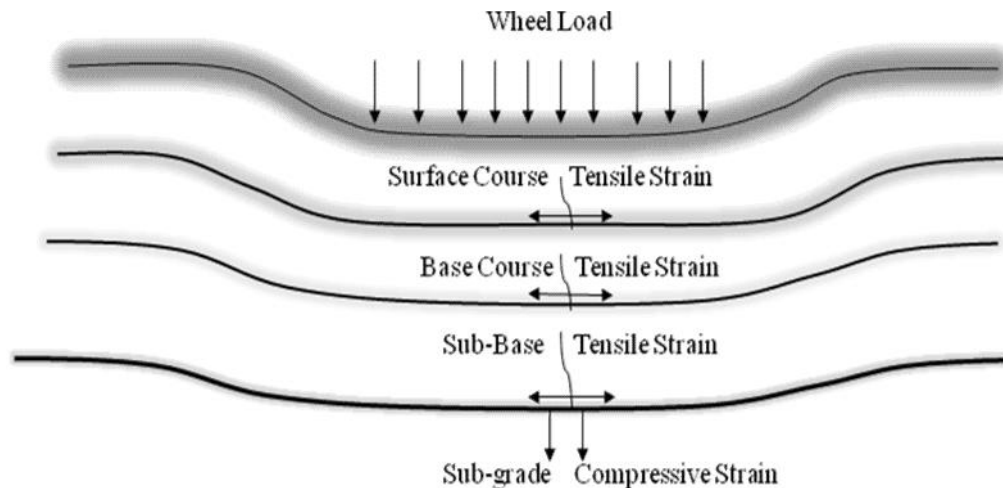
Critical strains and failure mode in pavement structures
